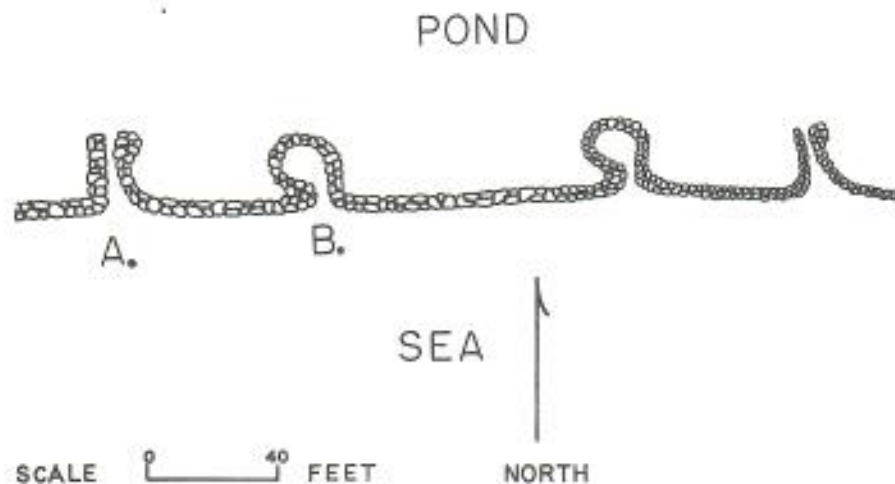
Section of the wall of Papa'ili'ili Pond, Ka'amaia, Molokai. A, Inward lane showing platform on eastern side of the end of the lane; western wall of lane was 21.6 feet long. B, Closed inward lane, 2.6 feet wide at wall, 16 feet long, 14 feet wide (inside dimension). Note platform on western side. (Adapted from plan by Stokes.)
